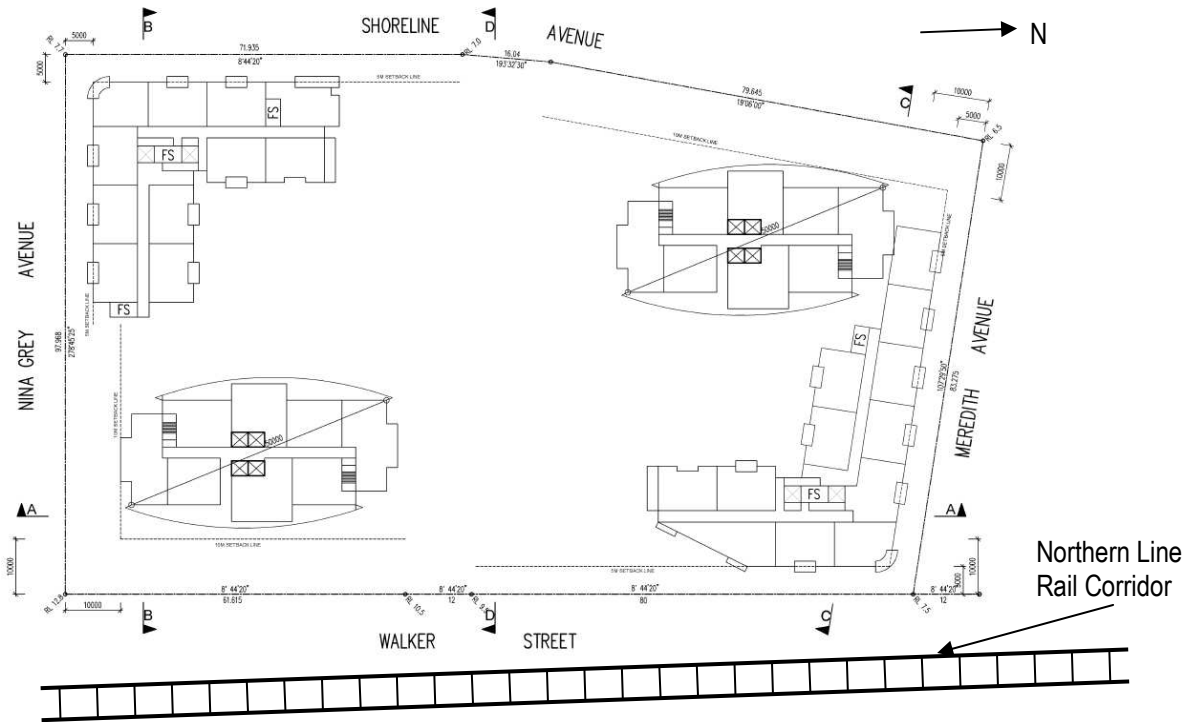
Site Plan Showing Northern Line Rail Corridor
